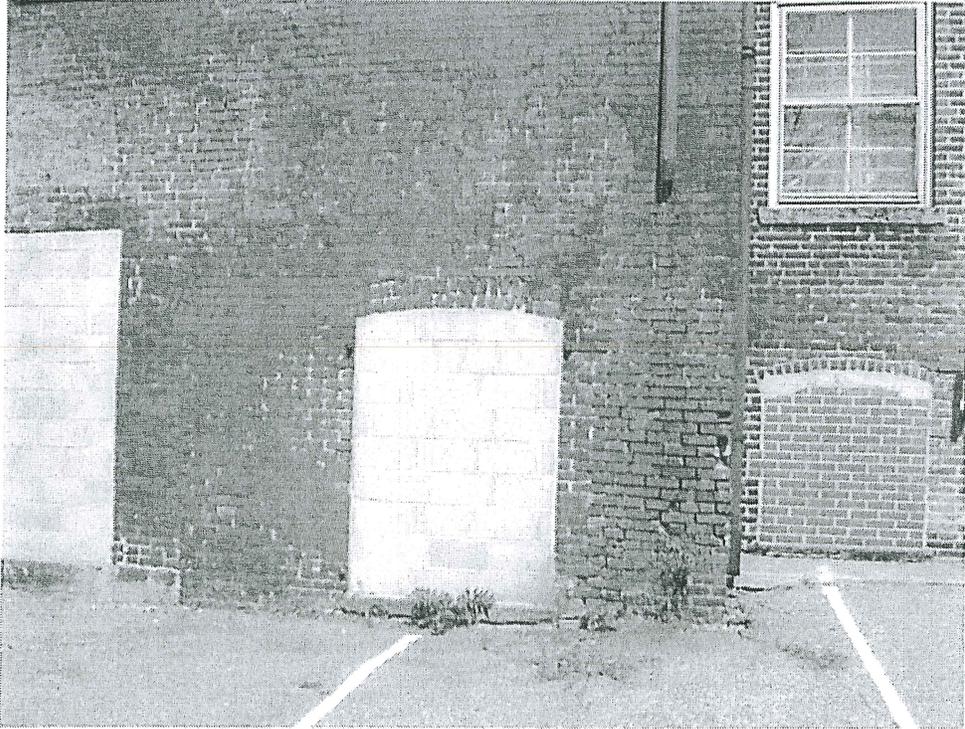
Detailed view of the condition of the brick at the rear of the building
